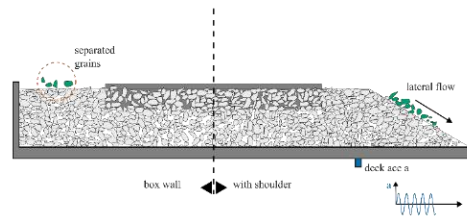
Track section on bridge deck. Ballast particle movement and separation at high accelerations indicated.
